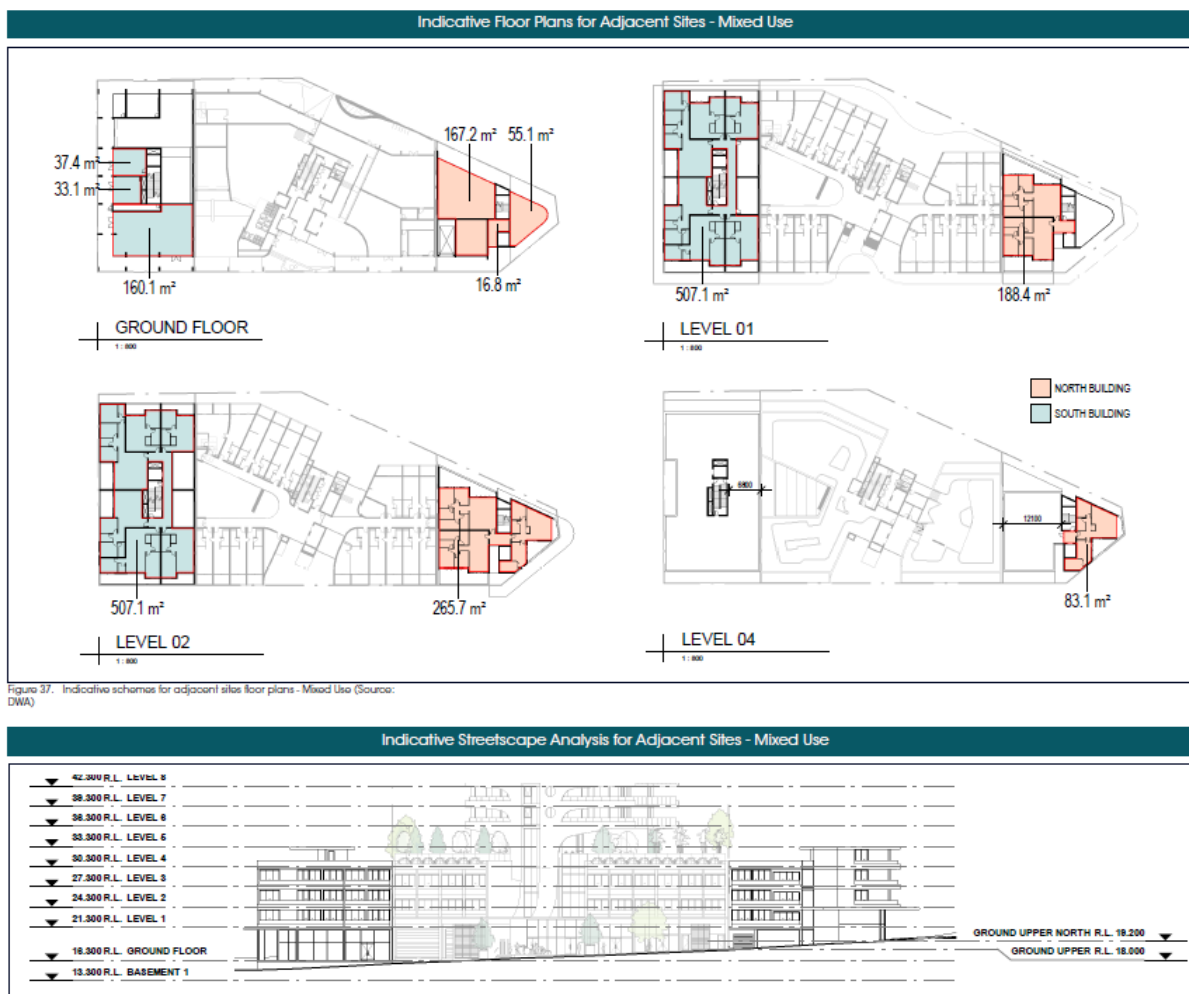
Indicative Floor plans and streetscape analysis - Mixed Use
